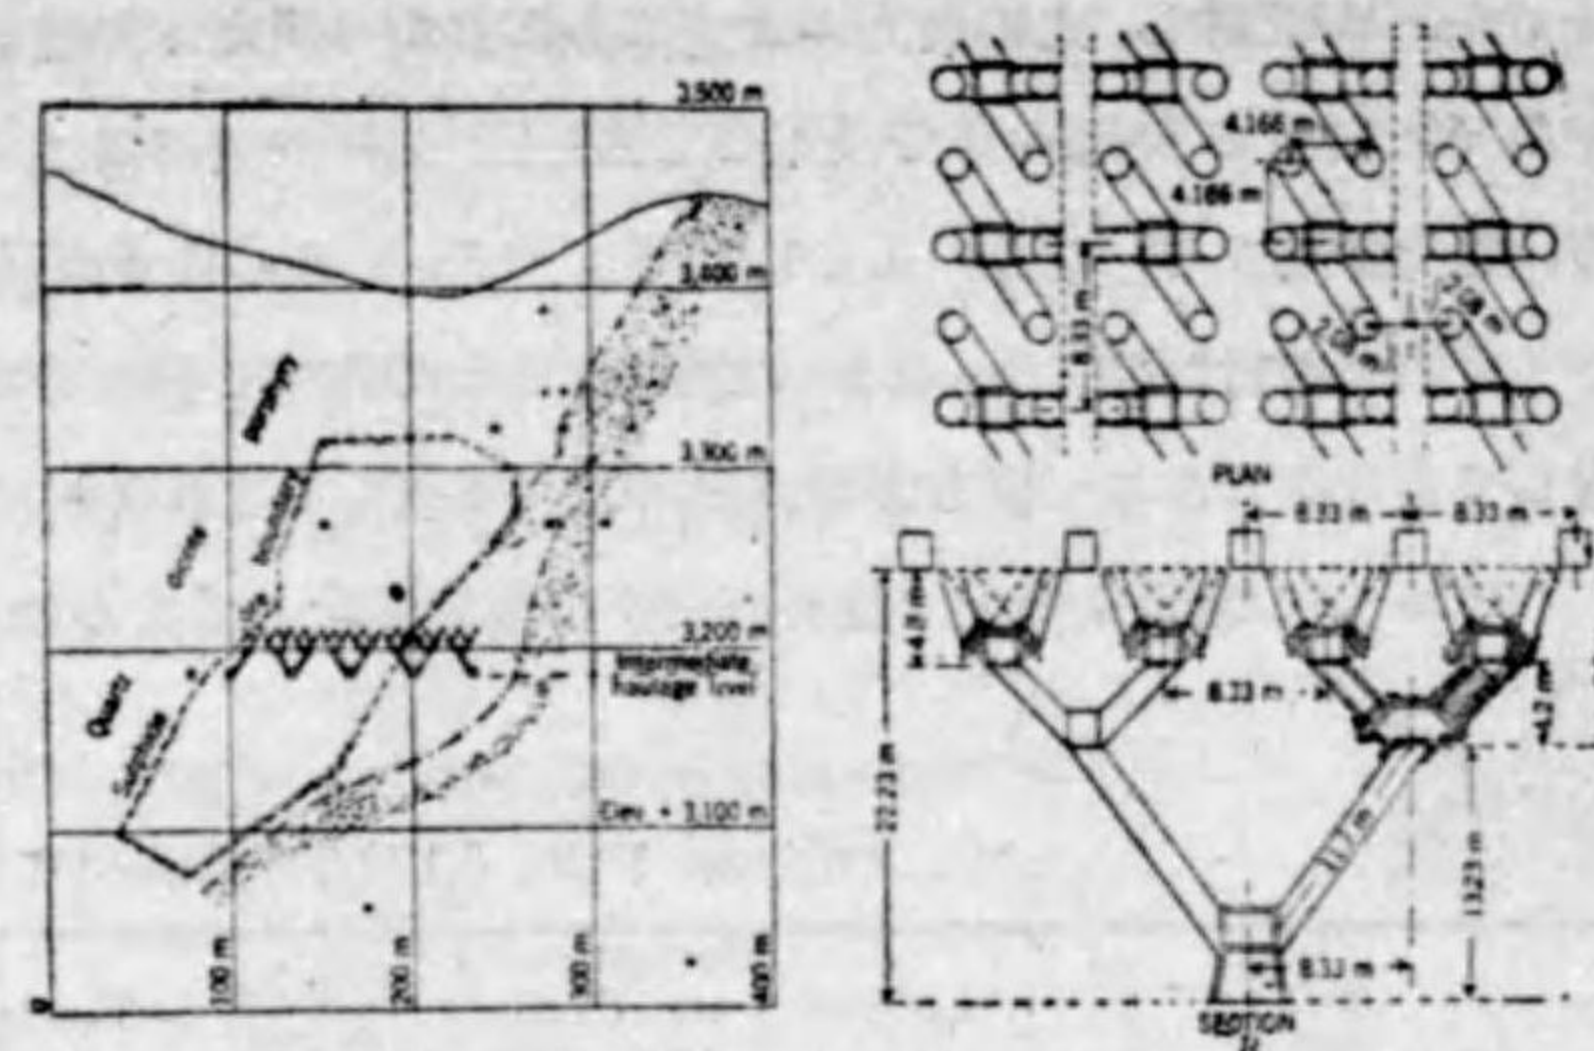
Undercut caving, Andes Copper Mining Co., Chile: A, Transverse section, south sulphide ore body; B, Plan and section showing branch-raise system.
